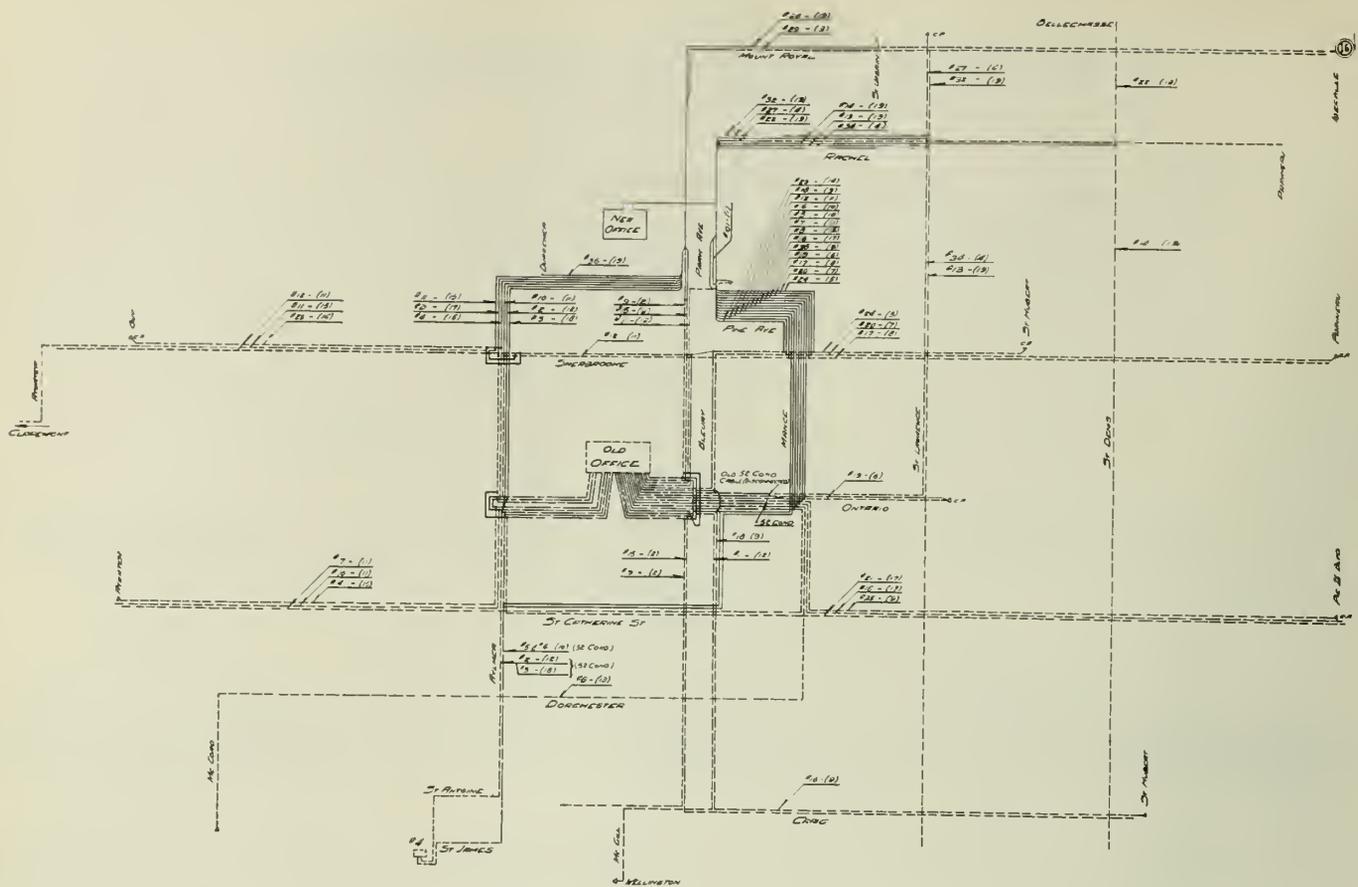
Cable Layout—Connections from Old Stations to New Central Station.
